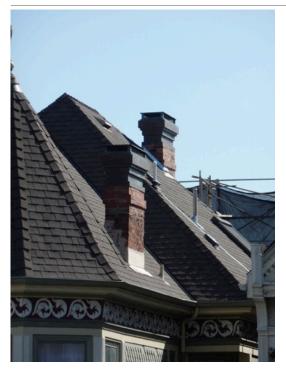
Detail of chimneys at south end of roof. (Photograph by Garavaglia Architecture, Inc., April 2015.)
